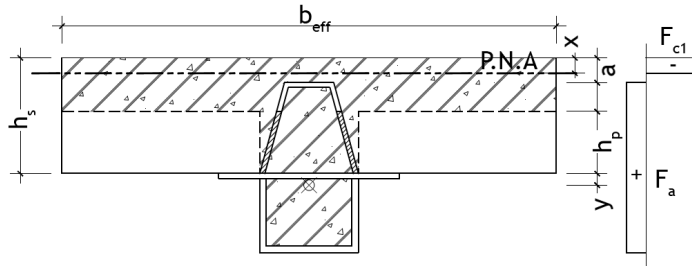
The P.N.A lies within the concrete slab above the steel beam
